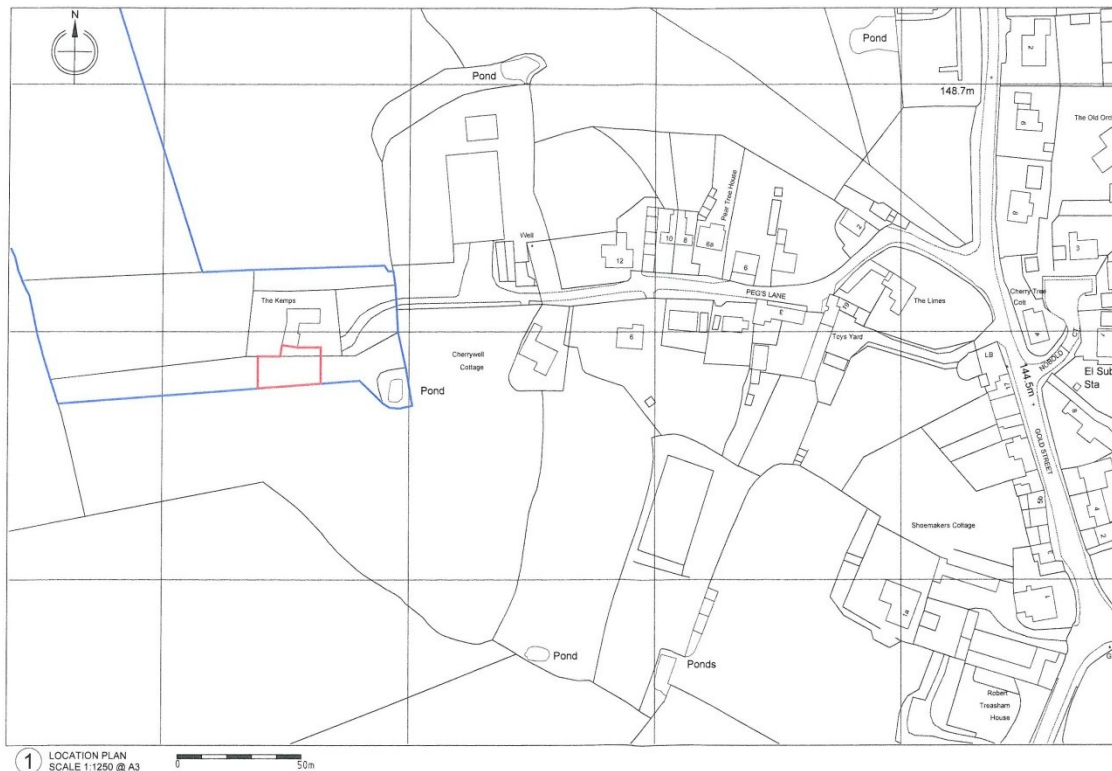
Location plan within Clipston, red shaded area (plan provided by client)
